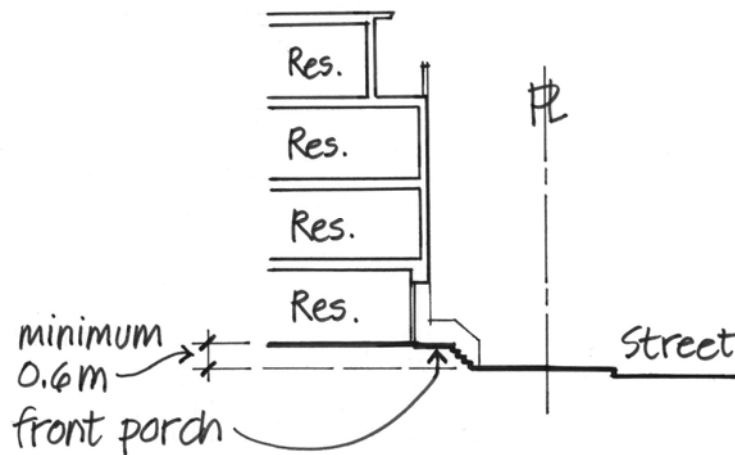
Ground floor residential units facing a street raised a minimum of 0.6 m
